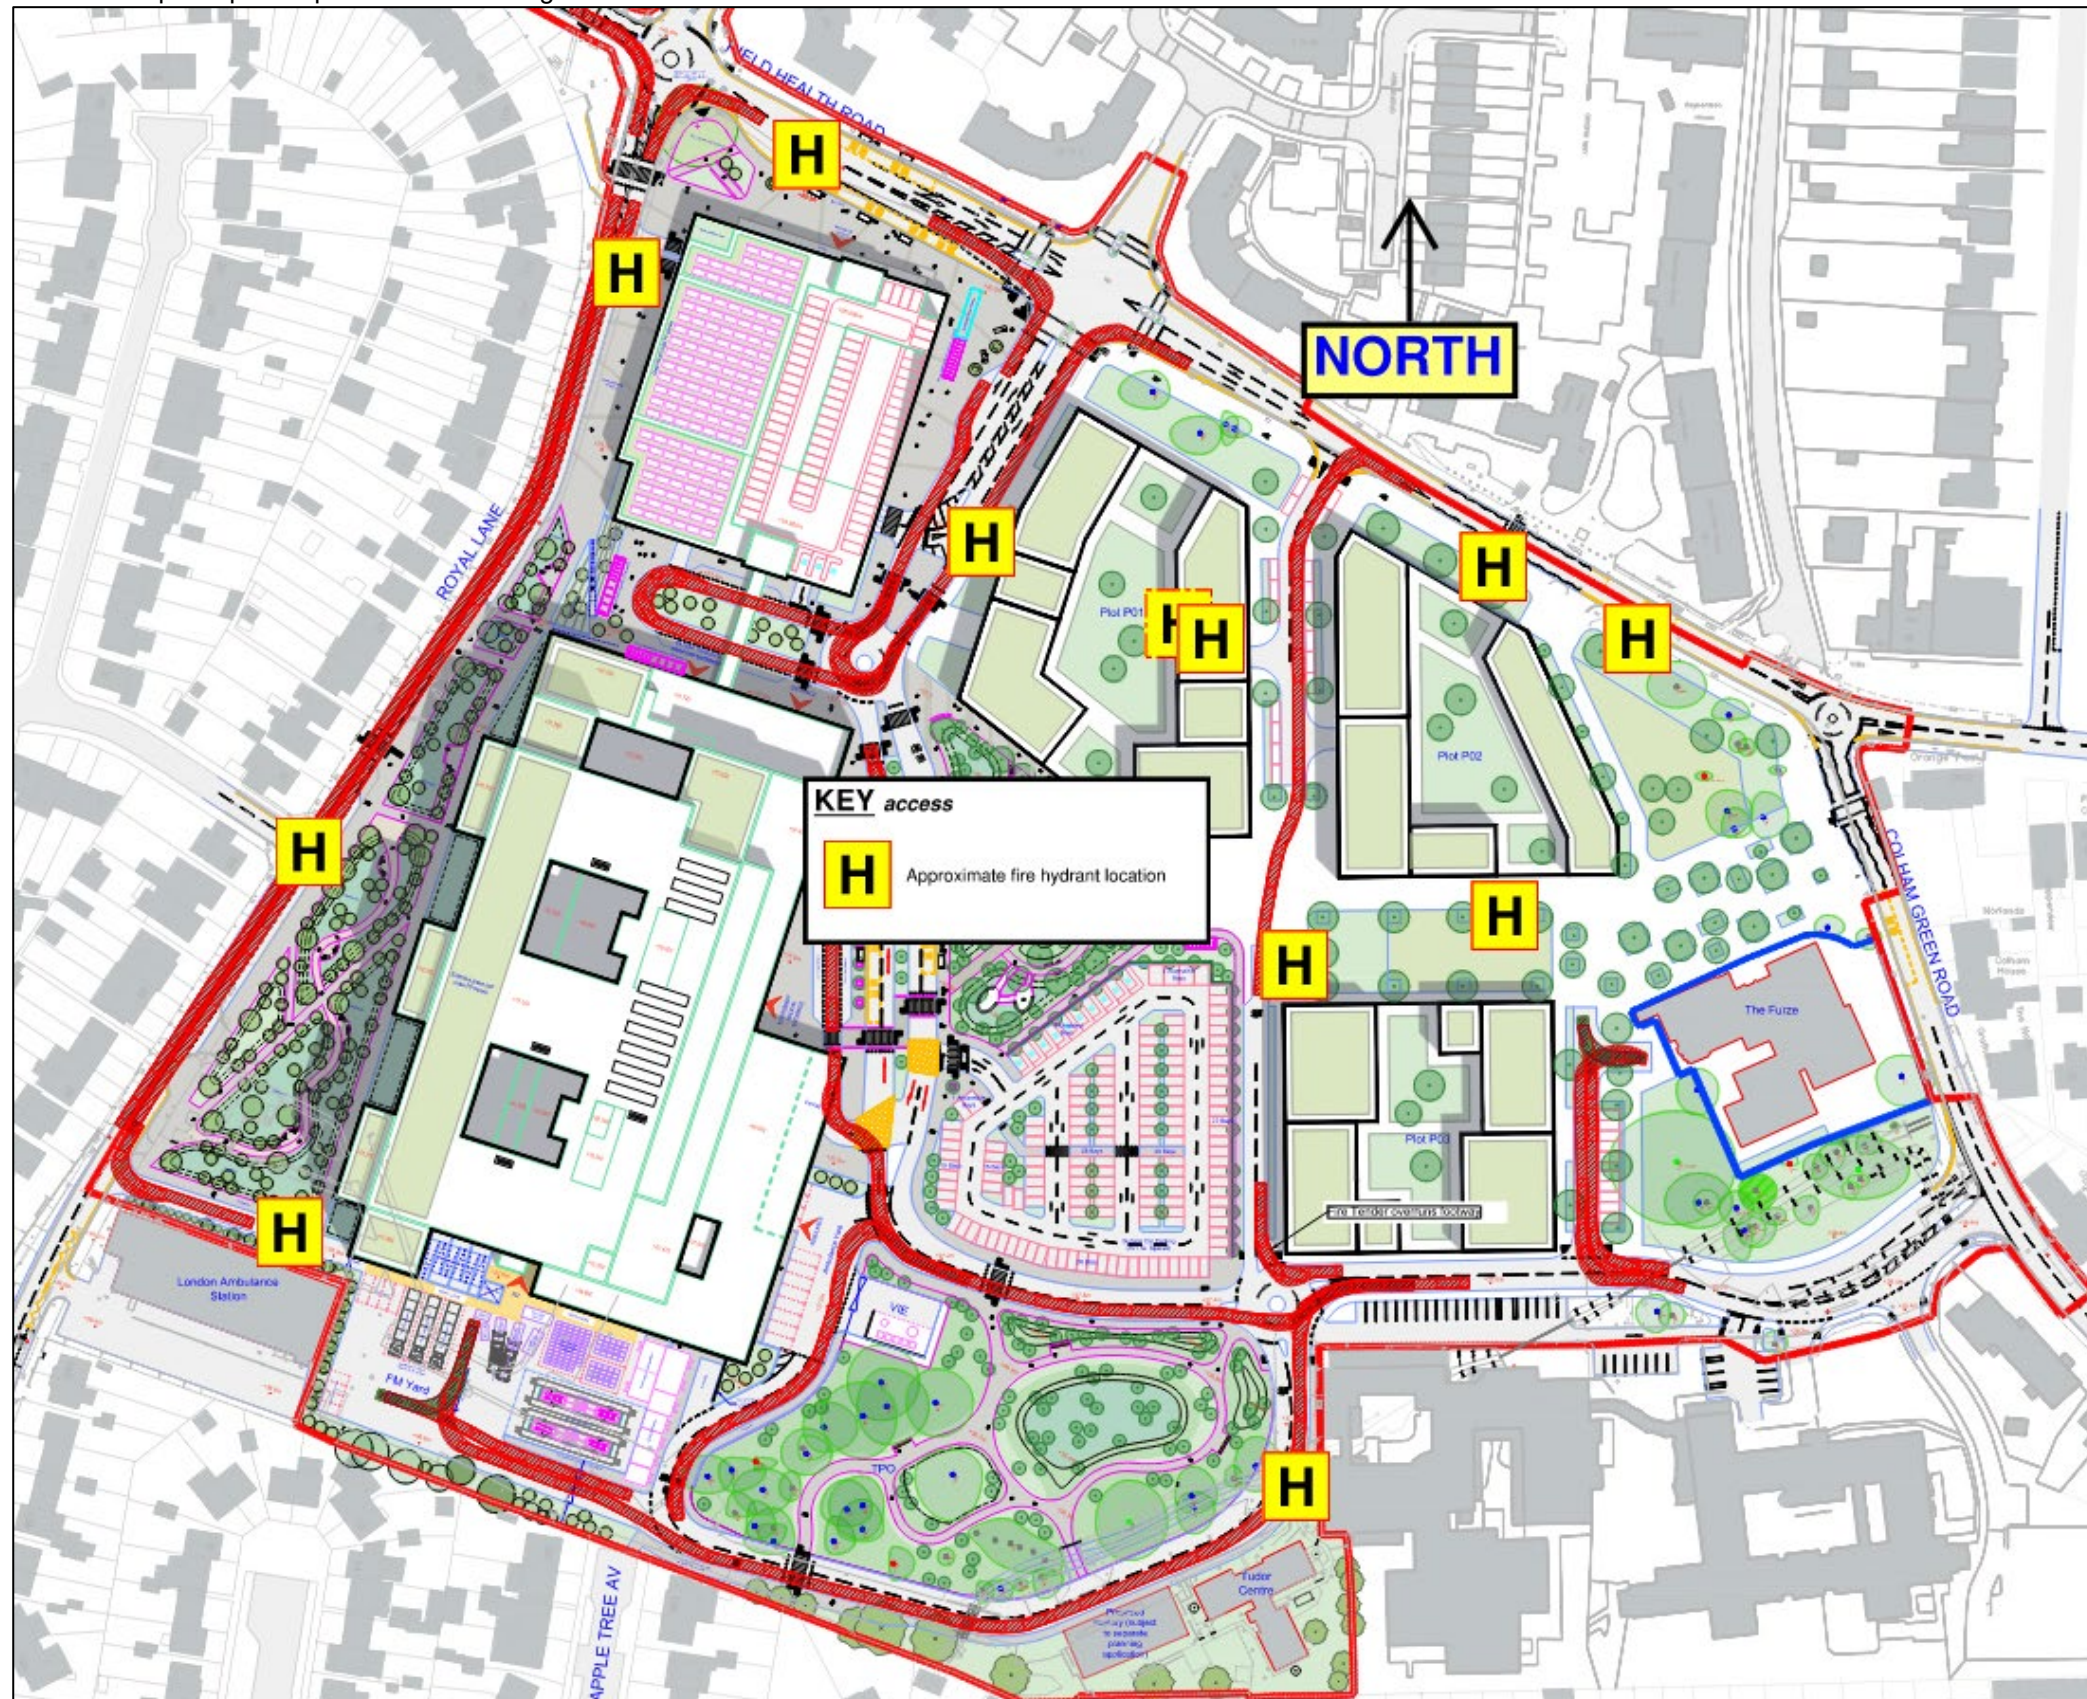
Schematic plan showing the key site facilities/arrangements for fire service access
